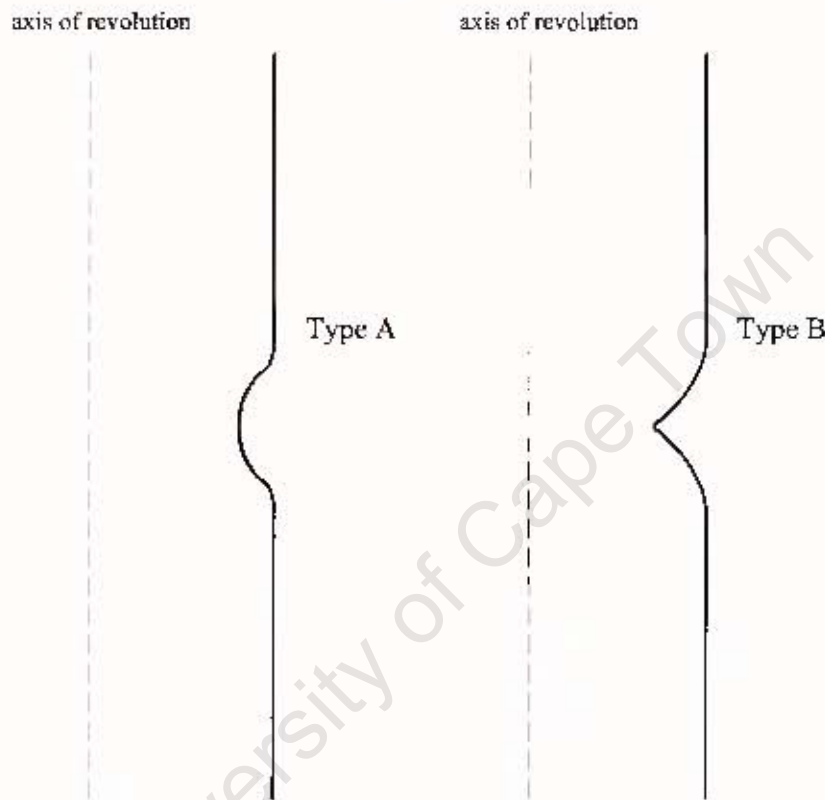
Idealized weld depression according to Rotter and Teng
